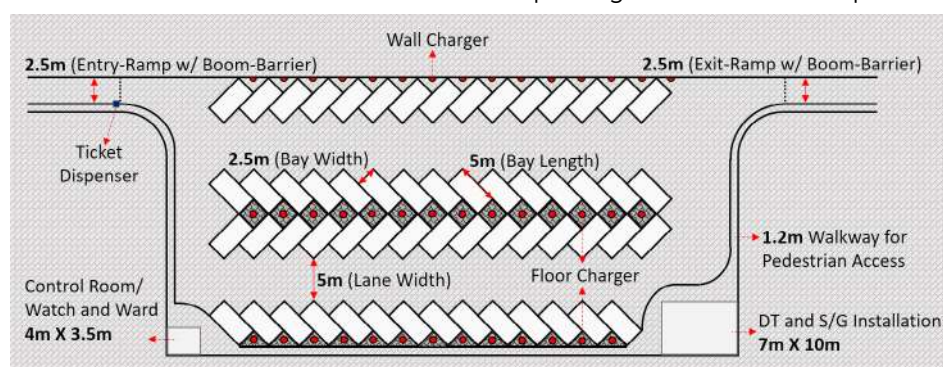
MODEL ANGULAR PARKING LAYOUT (OFF-STREET PARKING)¹²
